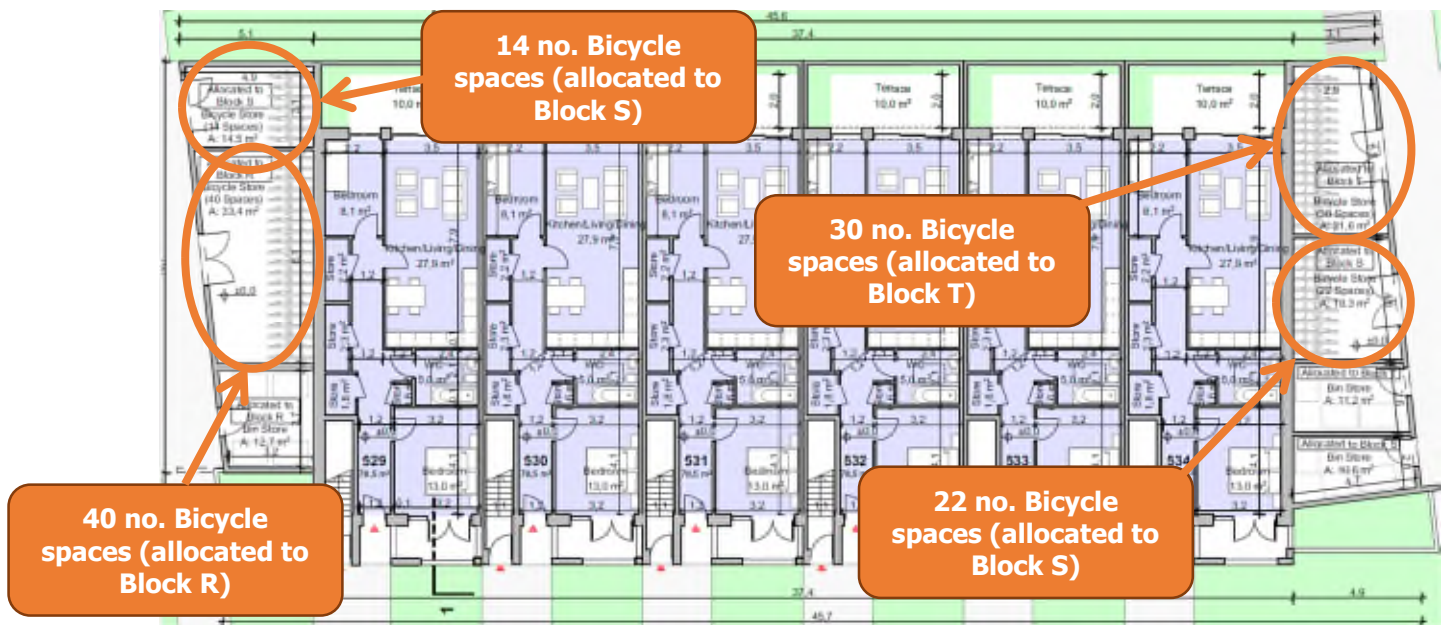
Block S Ground Floor Layout (Delphi Architects drawing no. D1408-19-PA30-CA5)
